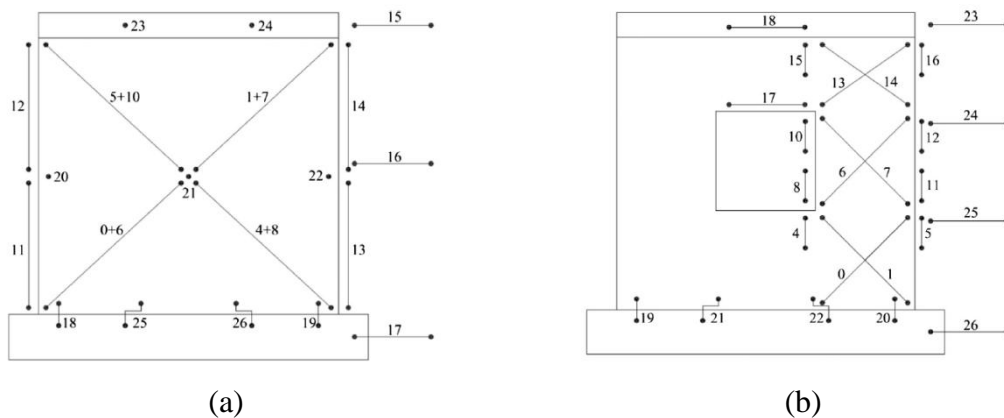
(a) Typical instrumentation for Wall type A; (b) Typical instrumentation for Wall type B.
